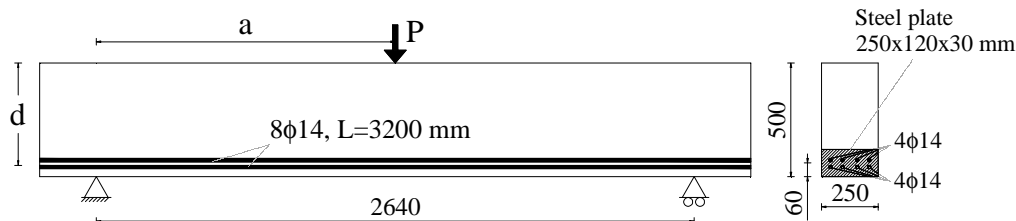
Sketch of the loading arrangement adopted during the experimental test and beam cross-section details [14] (dimensions in mm).
